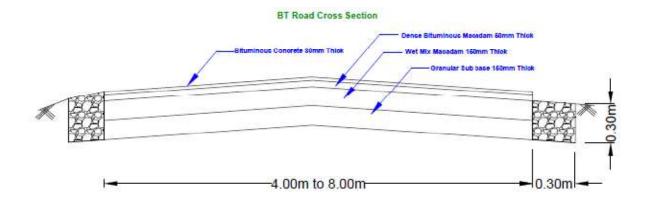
Model – Cross Section of Proposed Road with Drain
